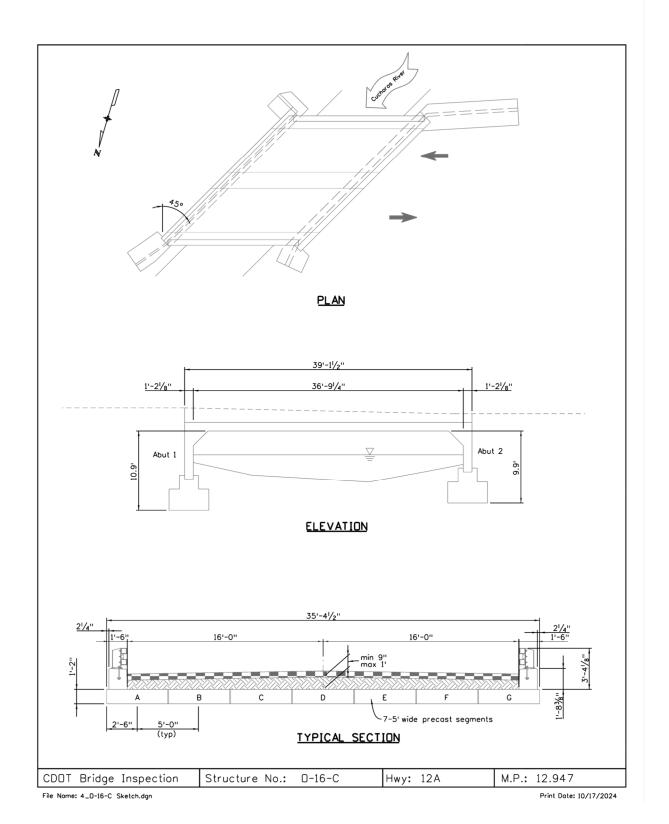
Bridge Inspection Sketch – Example 4
